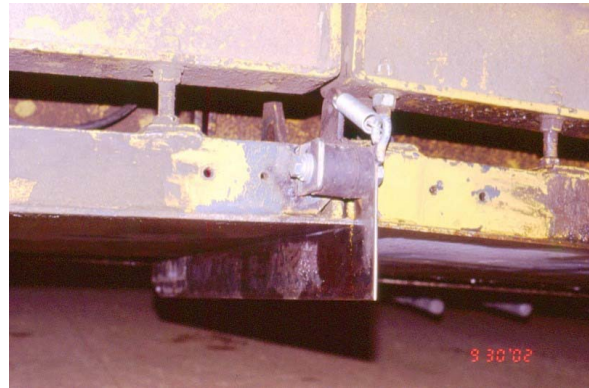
Front mounted joint forming knife, near paver vibrators.
